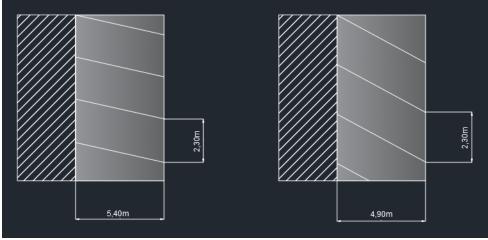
Variants of arranging parking spaces "On street" – "at an angle" of 60° and 45° to the traffic lane
